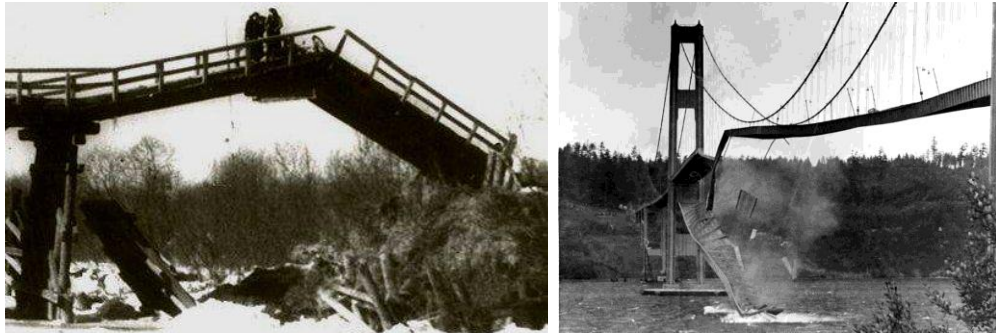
Examples of truss bridge failures such as buckling (left) and snapping (right).
